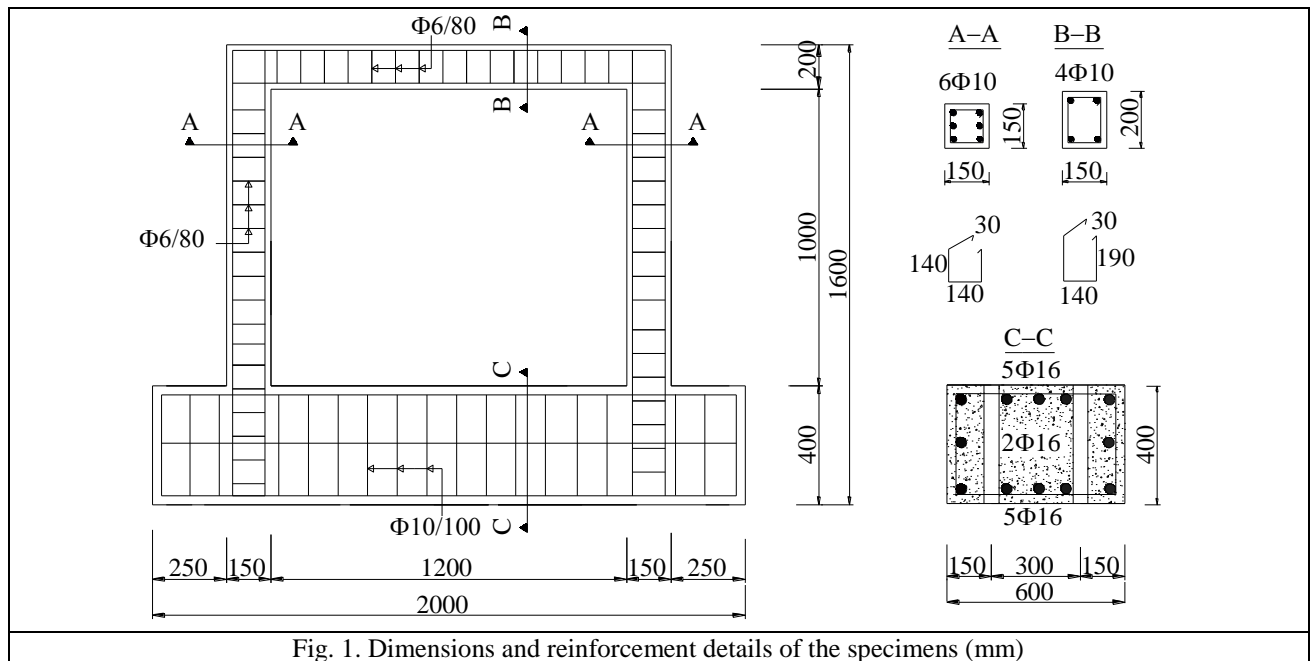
Dimensions and reinforcement details of the specimens (mm)
